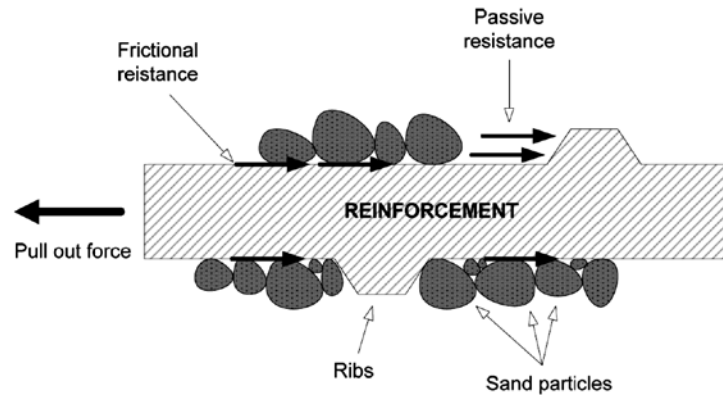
Stress transfer mechanisms in MSE wall reinforcement (FHWA 2007)
